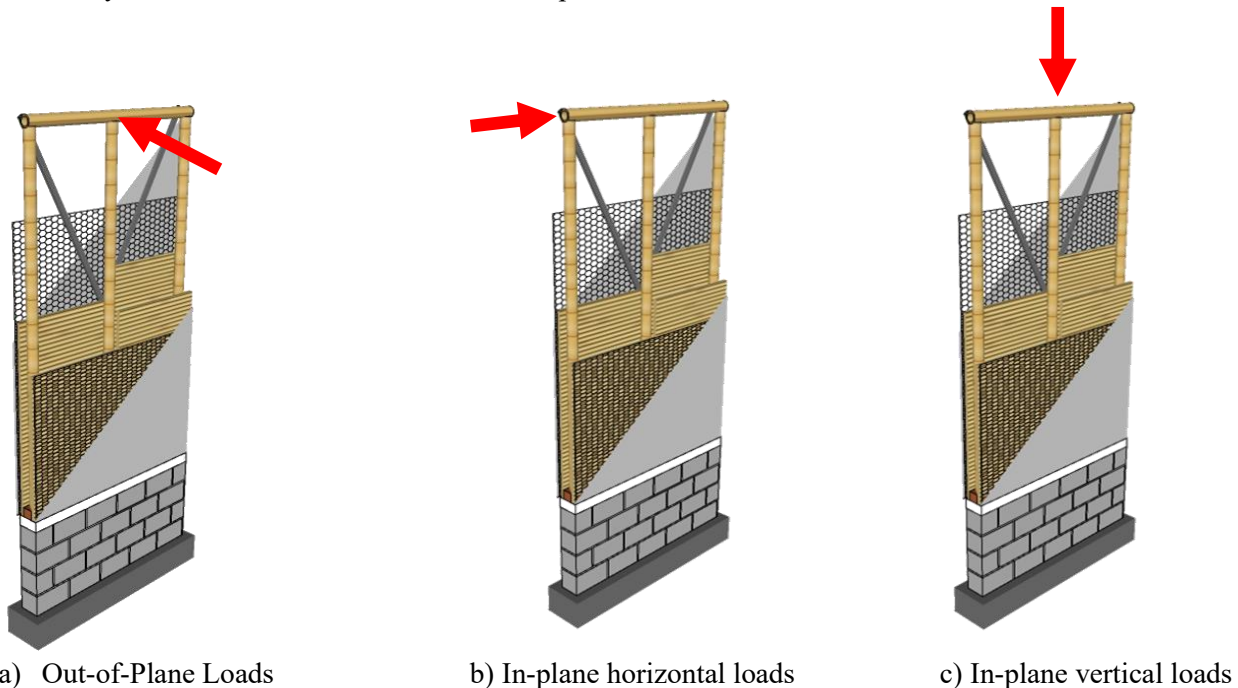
Examples of Light Cement Bamboo Frame (CBSW) Construction
